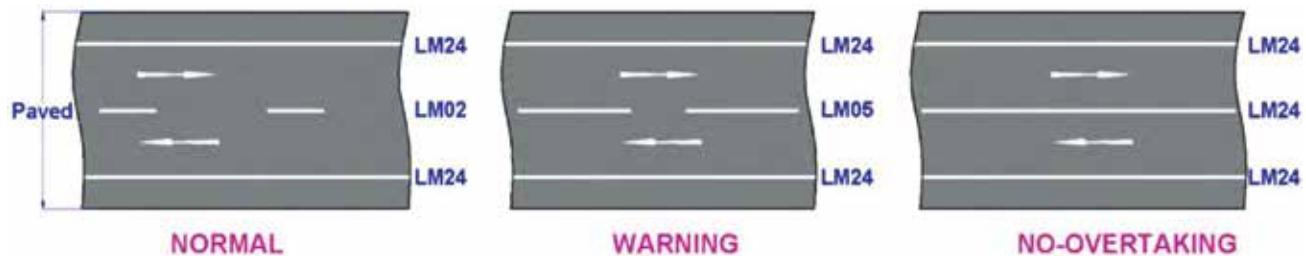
Two Lane Bi-Directional Road with Paved Shoulder
